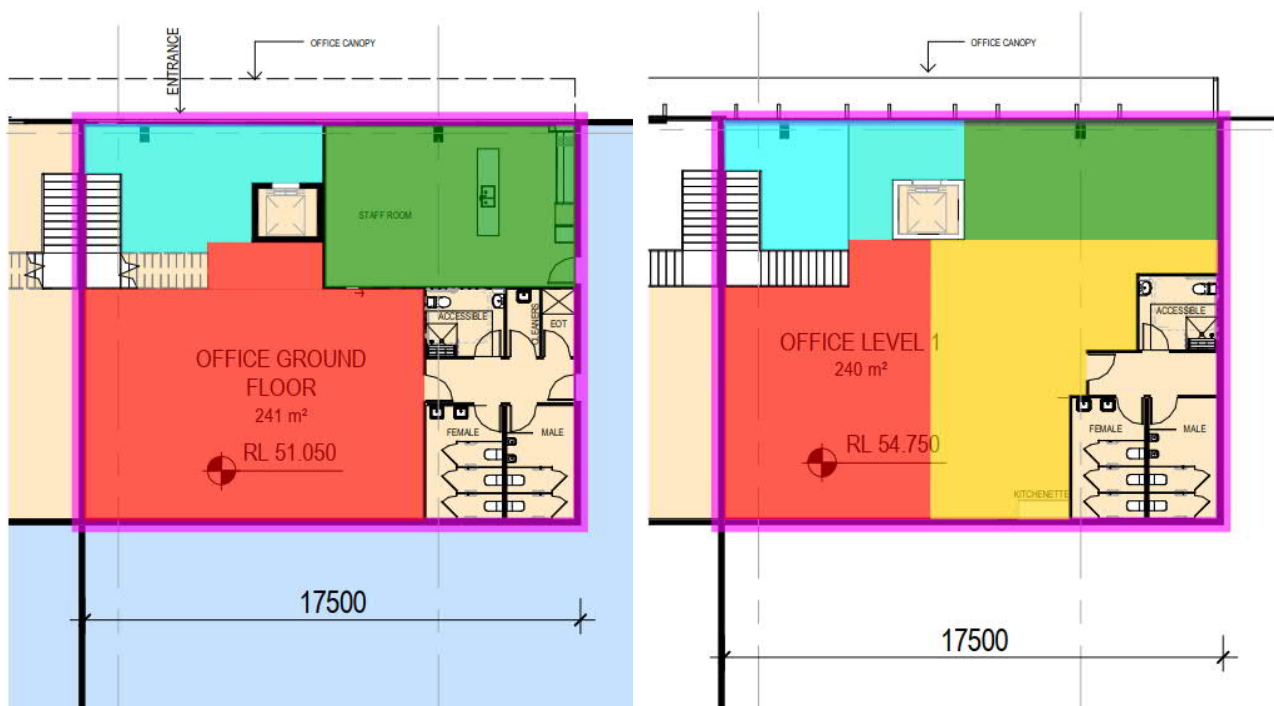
HVAC zones and thermal envelope for 9 Nursery Ave Ground Floor (Left) and First Floor (Right)
